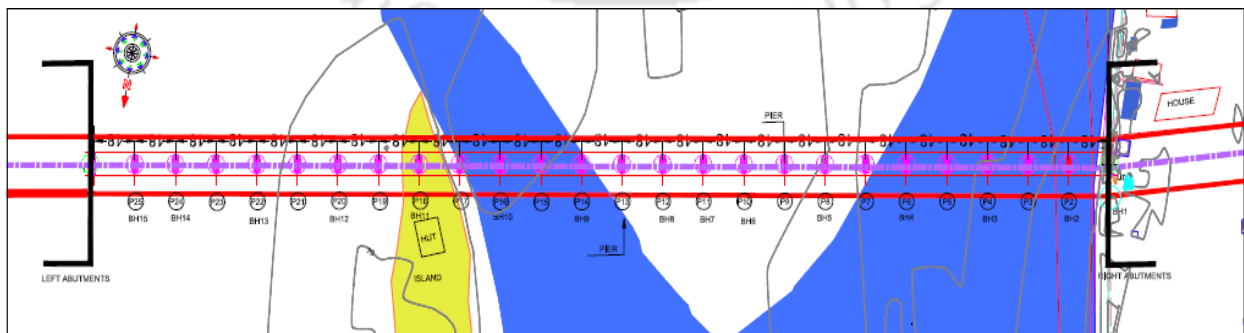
Section profile of the proposed bridge showing the locations of abutment and piers
